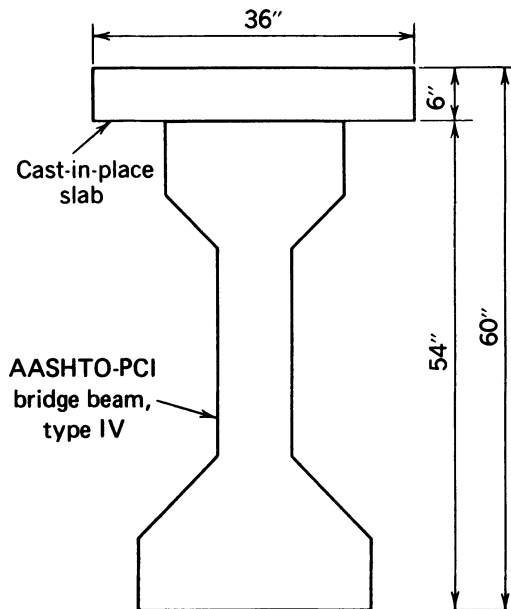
Composite section composed of AASHTO-PCI bridge beam, type IV, and 6×36 in. cast-in-place concrete slab.
